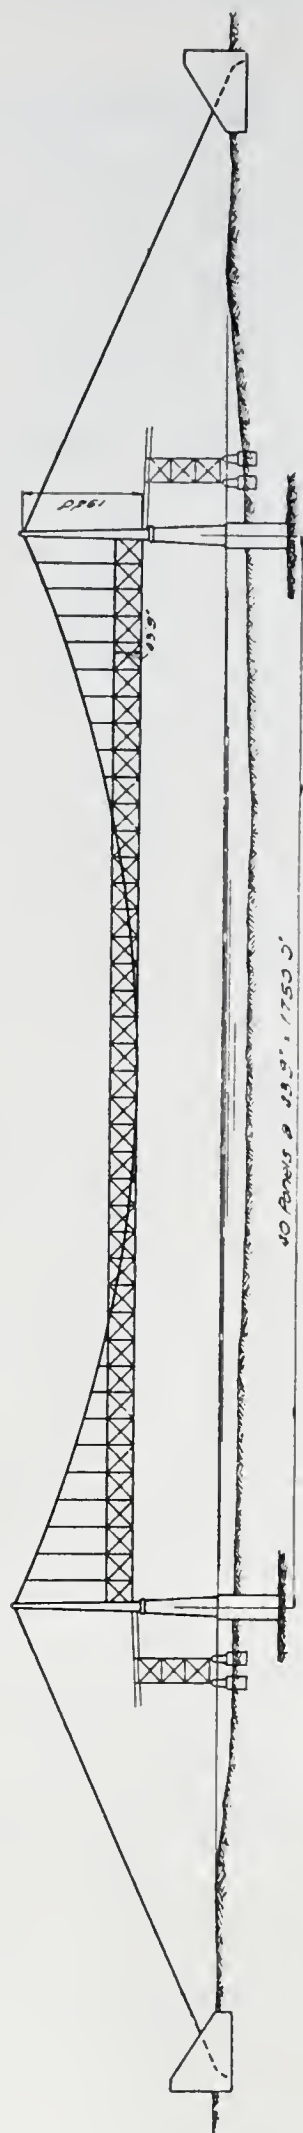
Lay-Out of Wire Cable Suspension Bridge.
